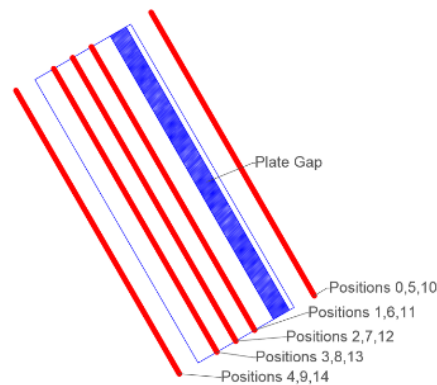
Location of accelerometer used for testing on flat plate expansion device
